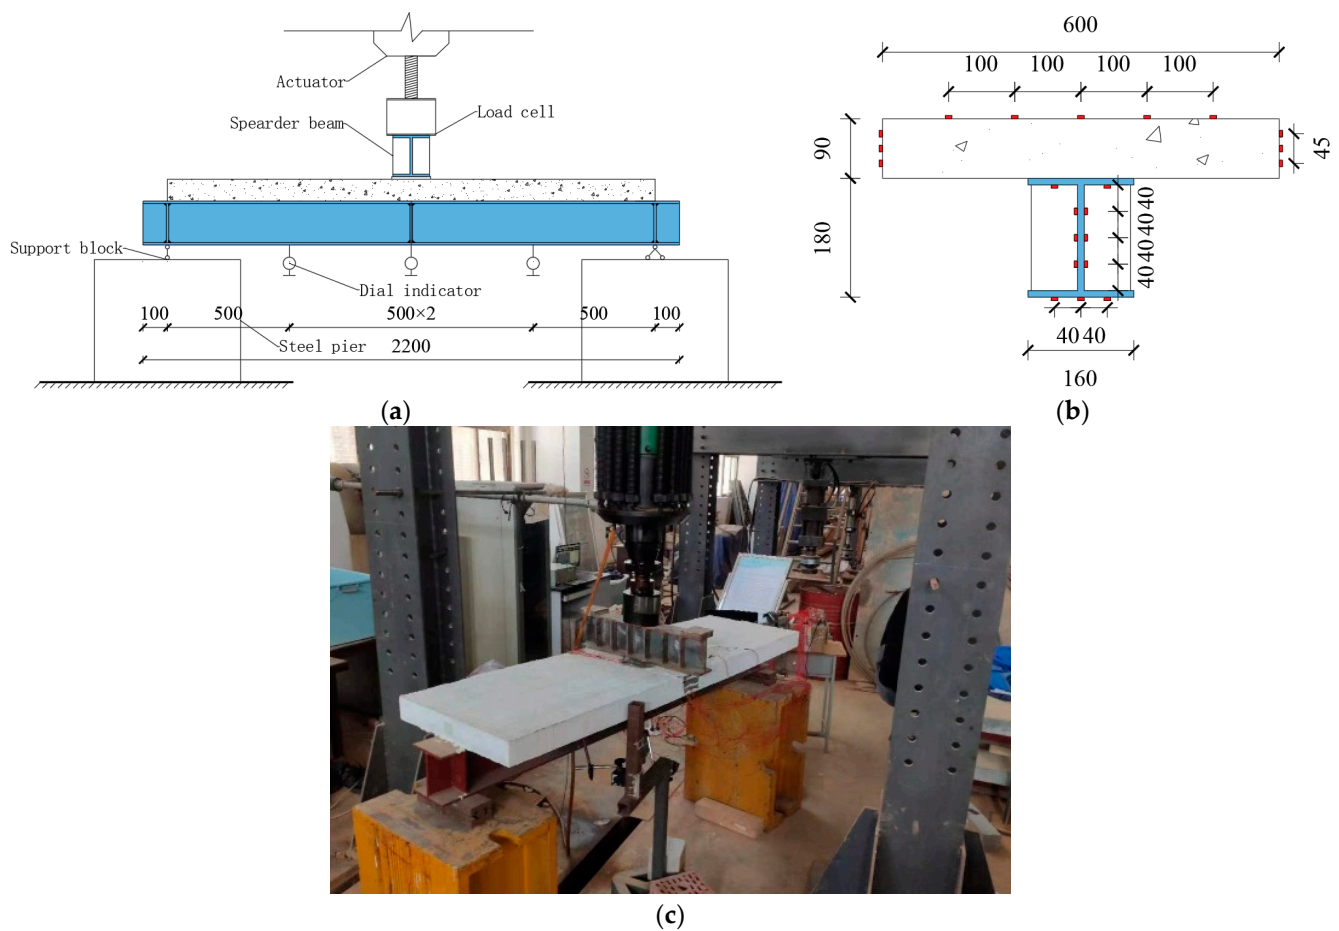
Test beam loading: (a) loading diagram, (b) measurement points layout, and (c) loading site diagram.
